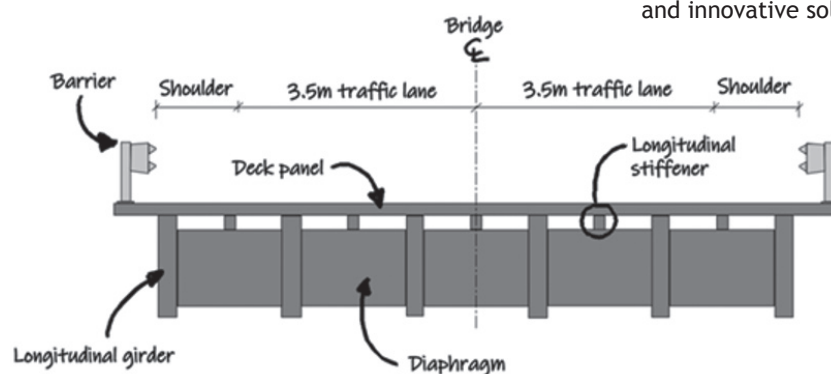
An illustration of a simple engineered timber beam and deck system (Holmes Consulting, 2022)
